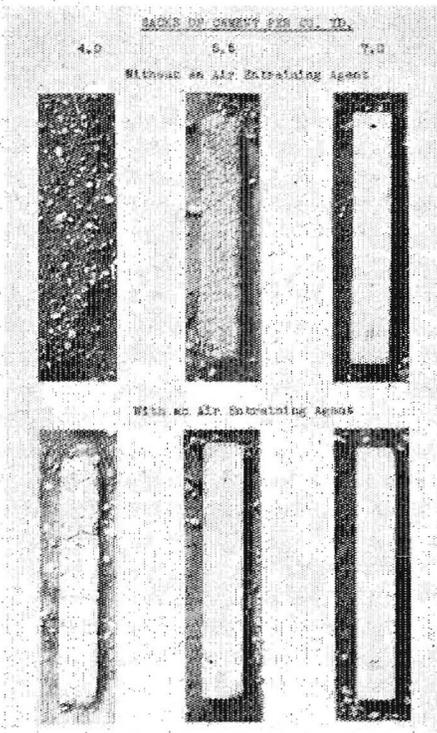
Showing condition of Type II cement (6.5% C_3A) concrete beam-specimens after five years' exposure to an alkali soil
